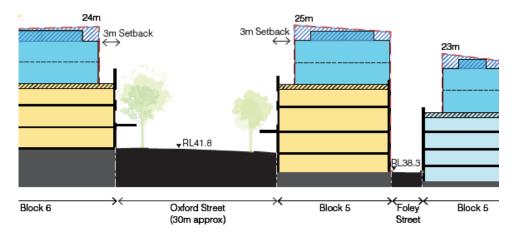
Above the street wall on the southern side of Foley Street, additional storeys are not required to be set back from the street frontage 5.X.4.3(6)
